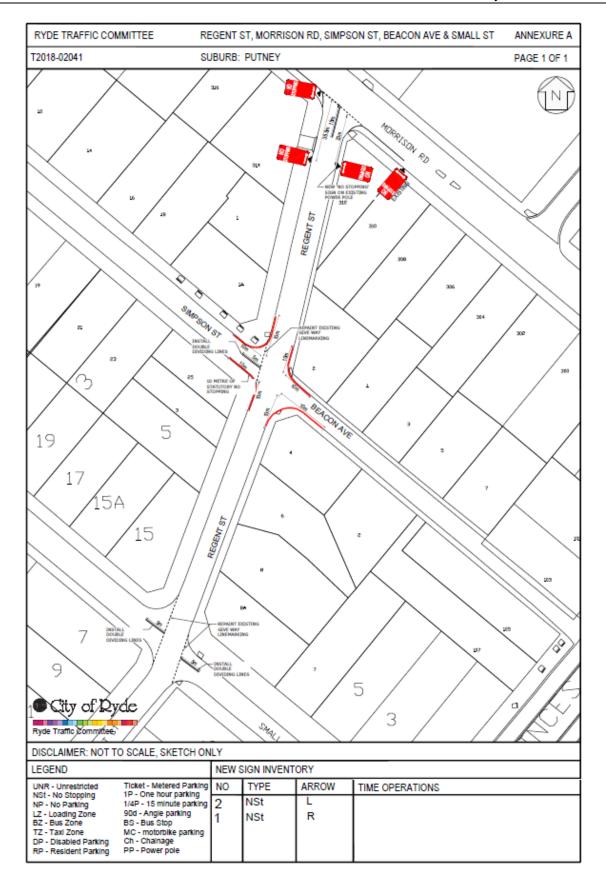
Proposed No Stopping on Regent St, Simpson St, Beacon Ave and Small St
